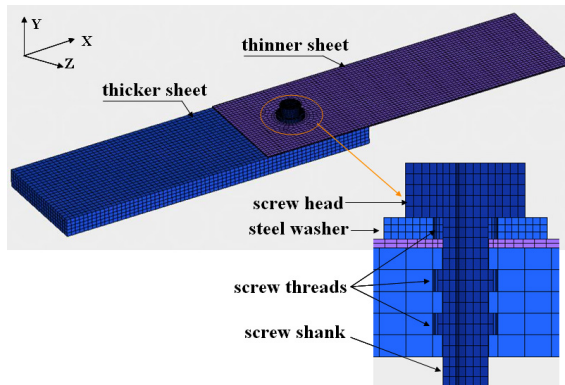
Structural modeling of single lap shear screw connection and connector details.
